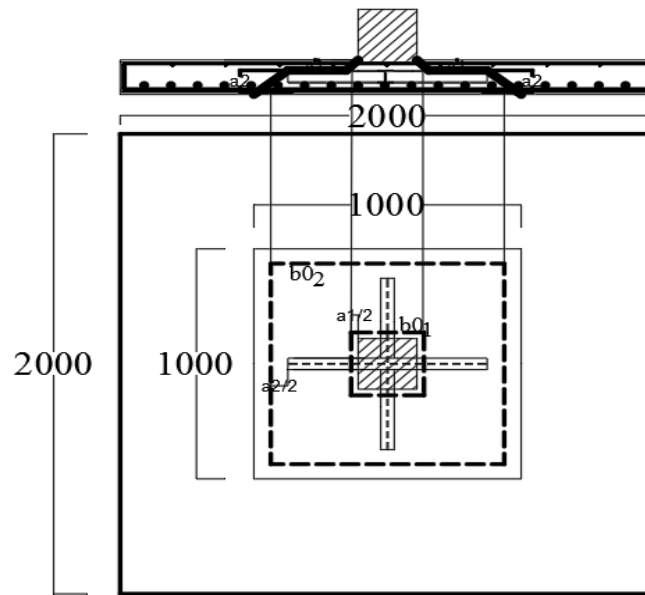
The suggested crack path in flat slab specimens with shear head reinforcement.
